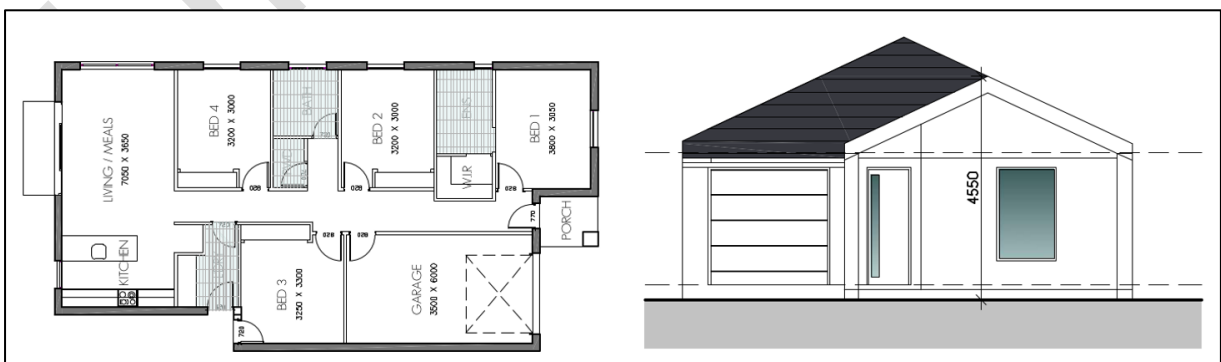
(above): Layout D Units floor plan (left) and front elevation (right). Source: Application documents.
